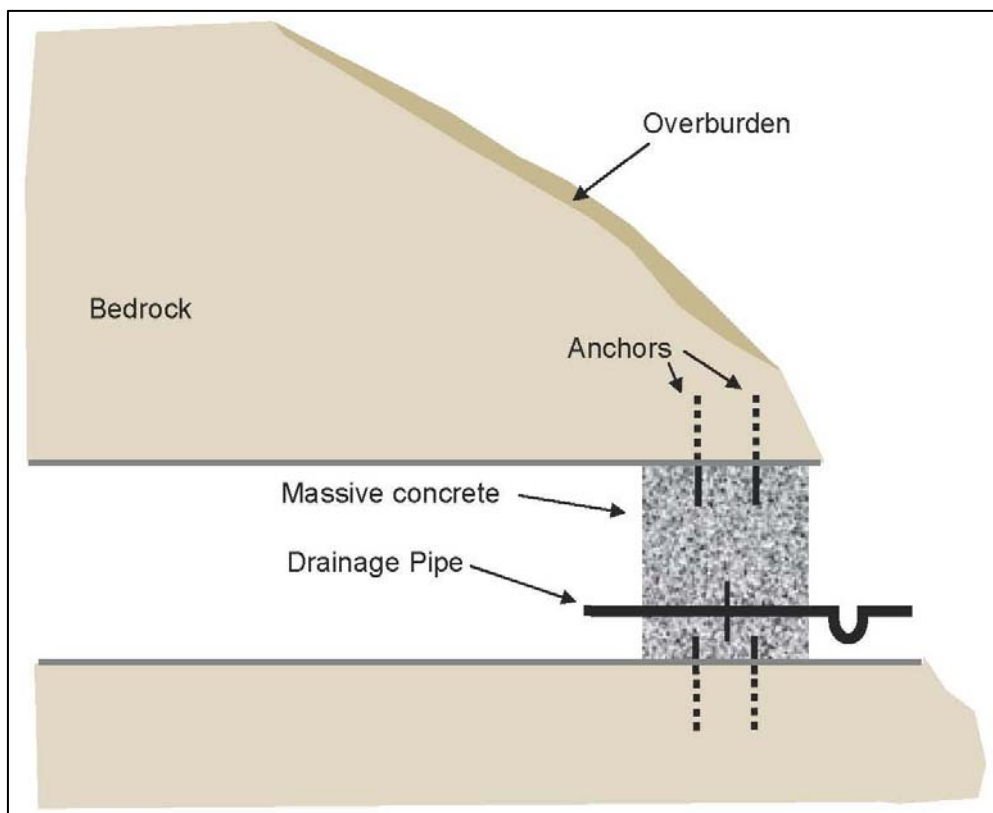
Conceptual Bellekeno 625 Adit Bulkhead
